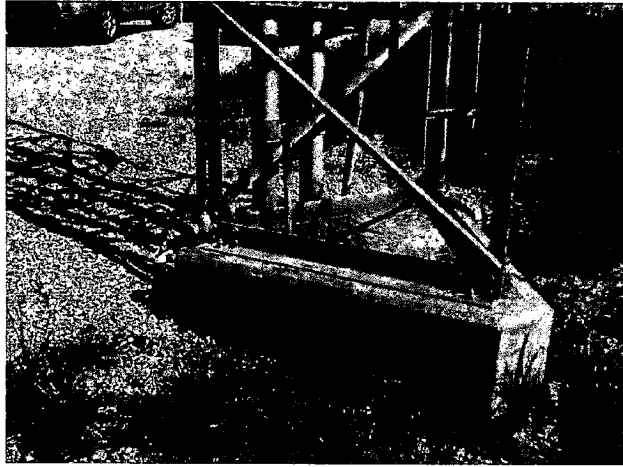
Connection of the Tower Lattice Structure with its Concrete Base
